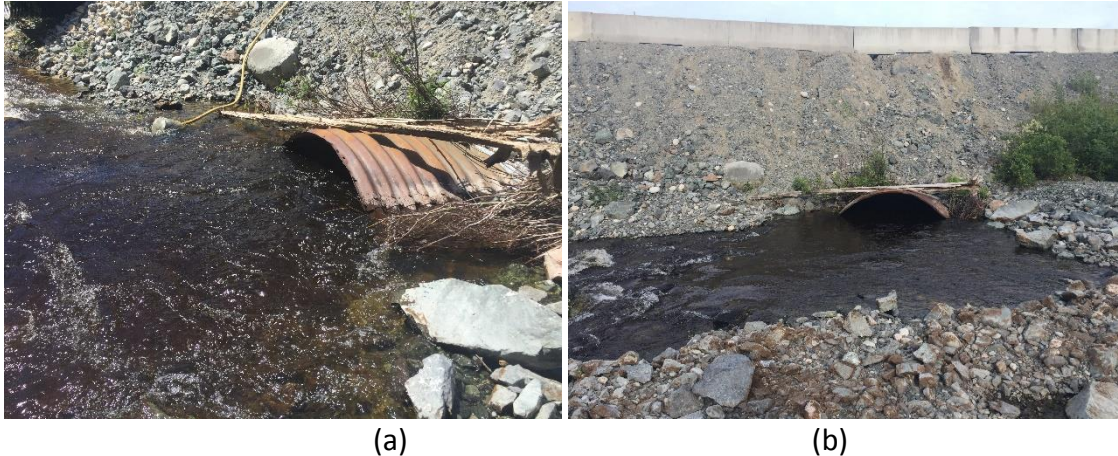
Water levels at outlet of existing culvert, (a) in June 2017 and (b) July 2017
